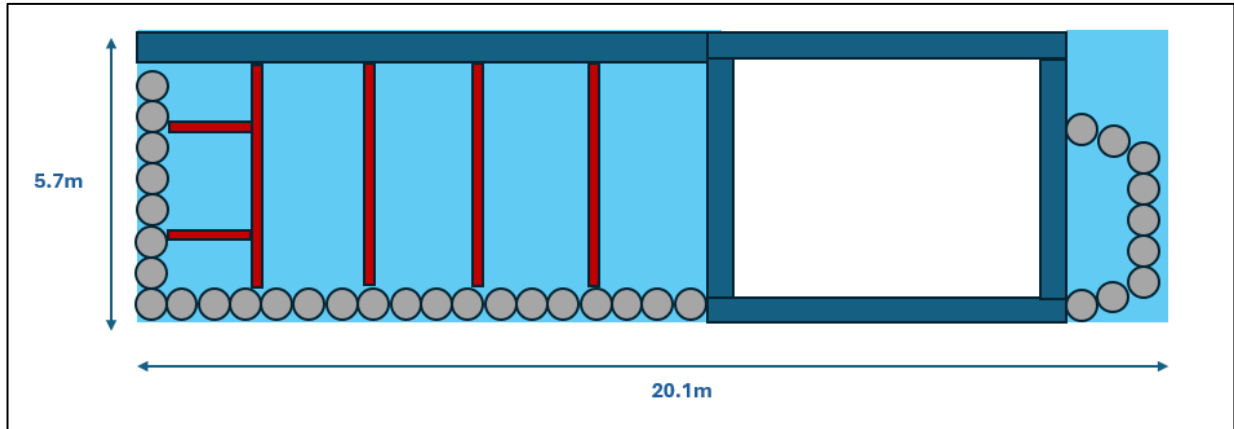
Stage 3 – Installation of Underpins to Rear Party Wall
